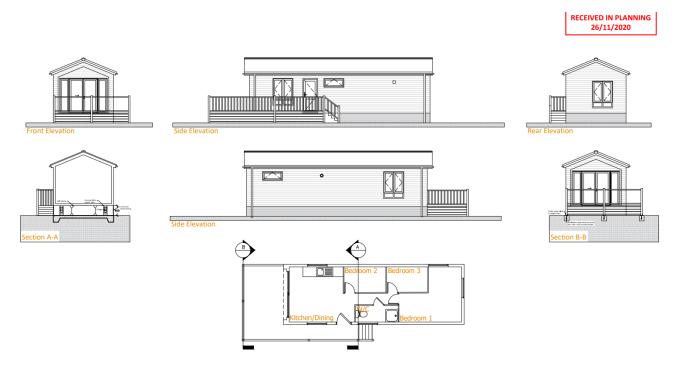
Proposed Elevations and Floor Plans of the Static Caravan:
